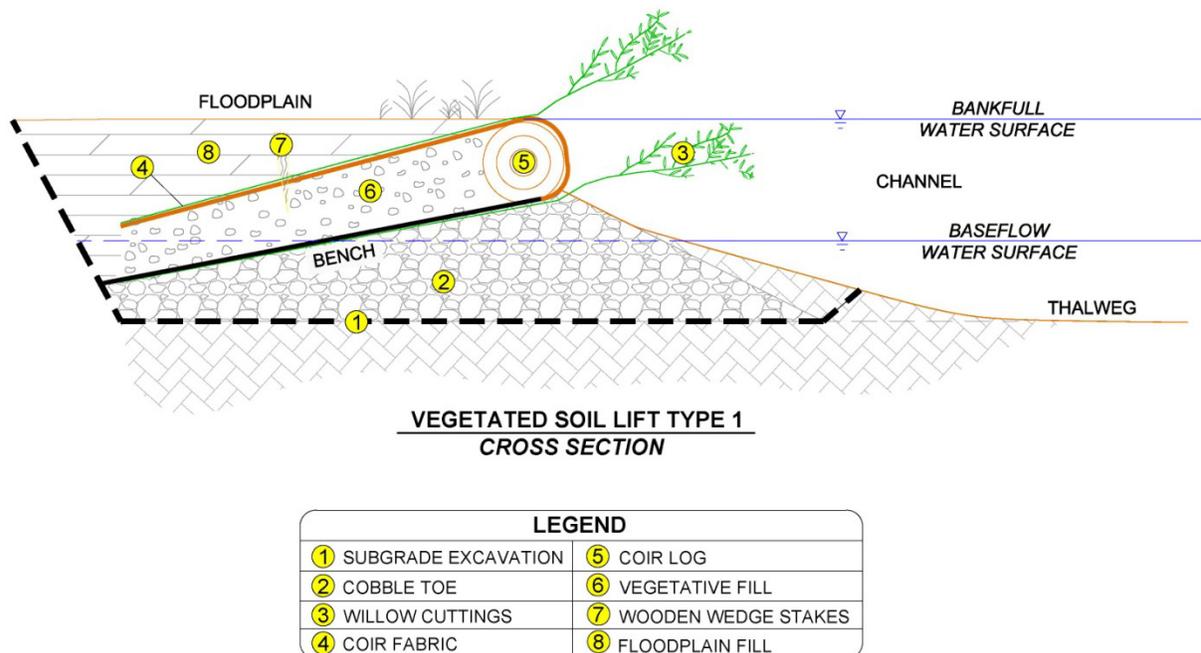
Conceptual cross section of a vegetated soil lift bioengineering treatment.
